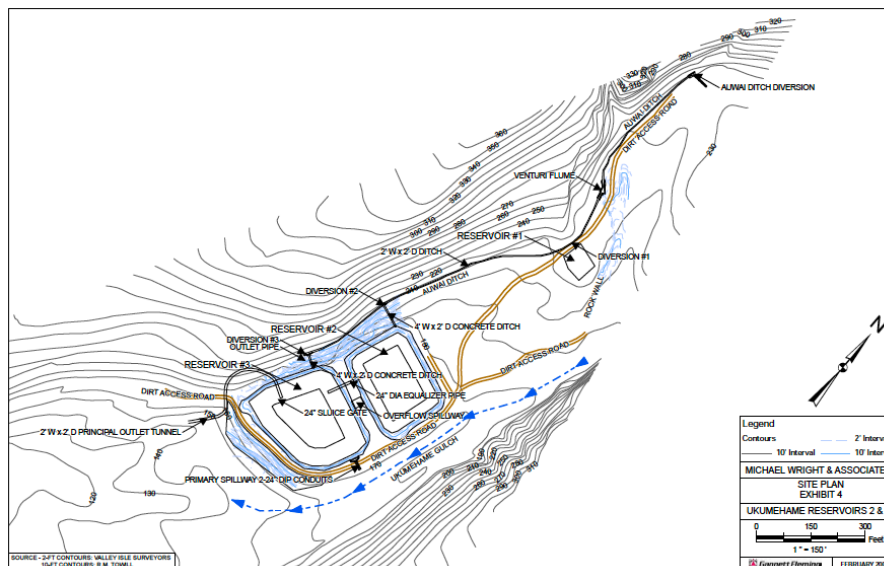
Plot plan. Source: Gannett Fleming Condition Assessment Report, April 2009.
